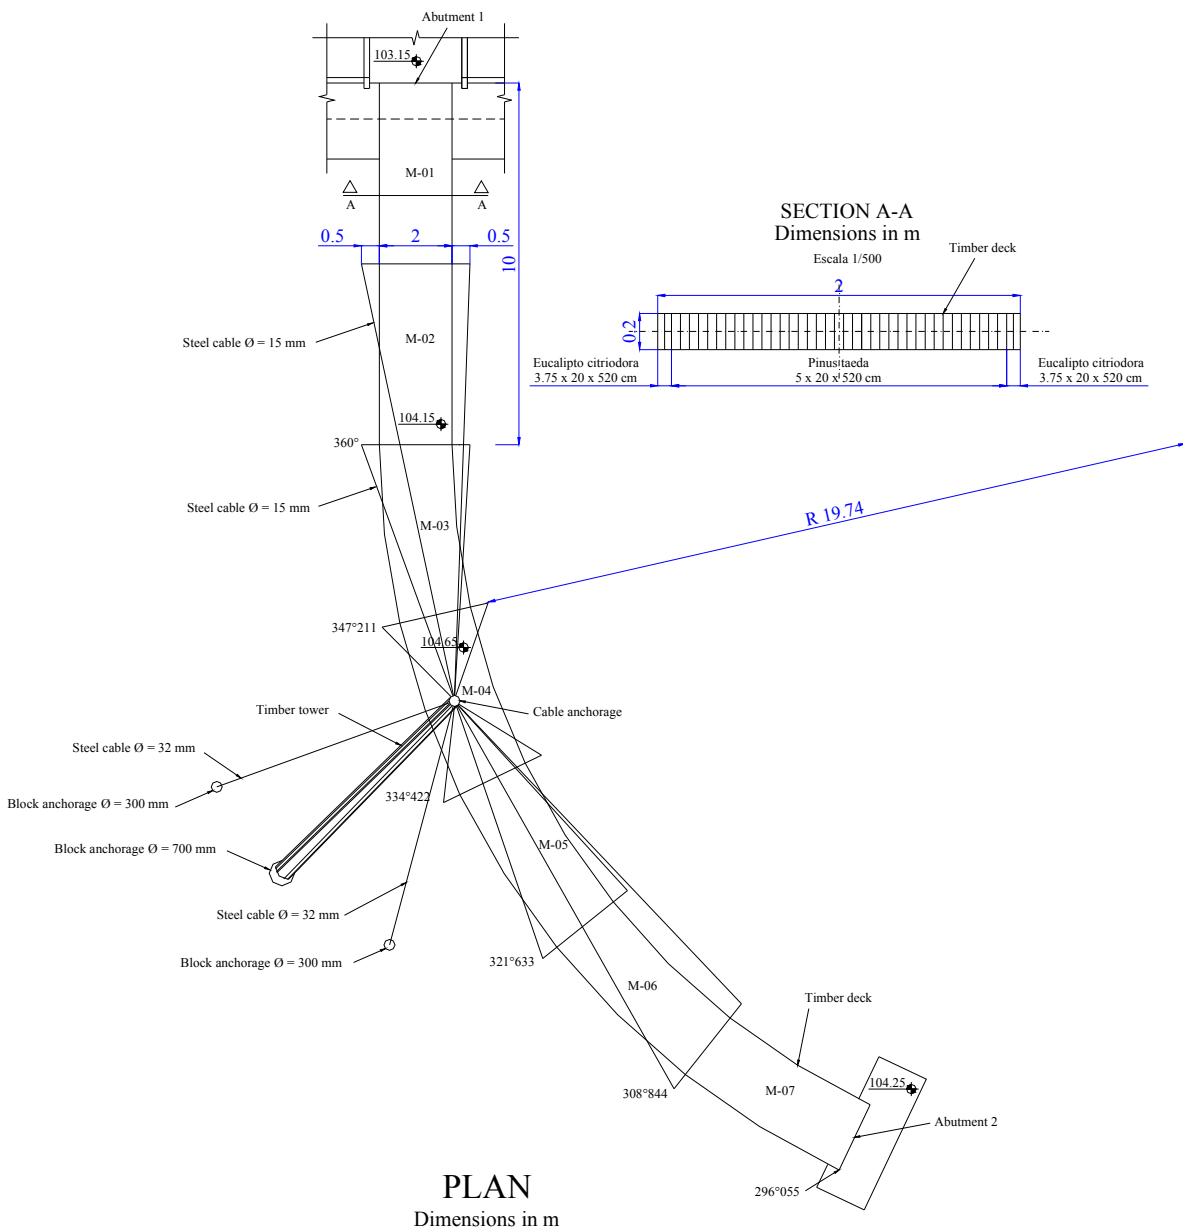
Plan view and section A-A of the cable-stayed timber footbridge, Pletz (2003)
